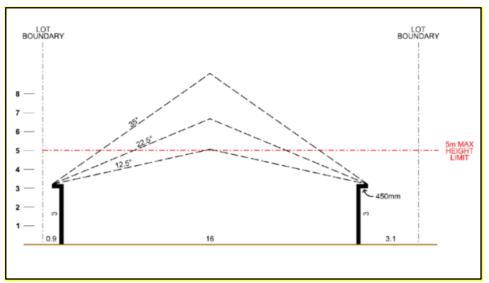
Five (5) metre maximum building height limit compared to roof pitches
